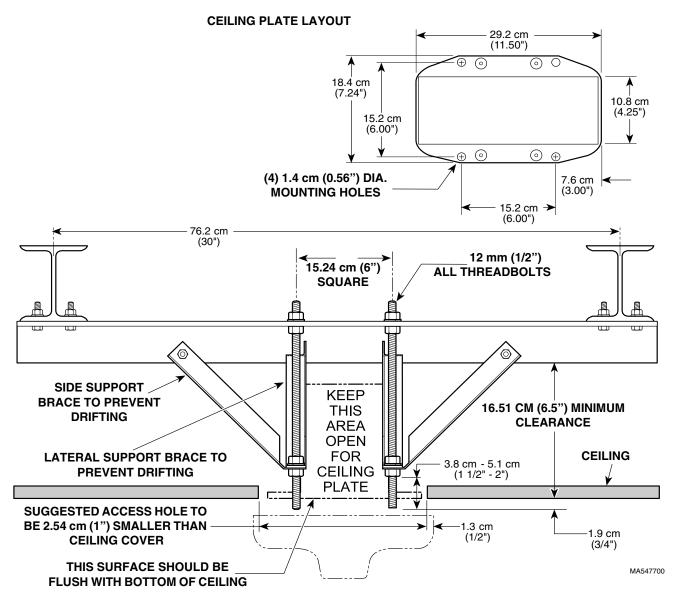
Suggested Ceiling Support Structure Installation (Illustration applies to Single and Dual Mounted Lighting Systems)
